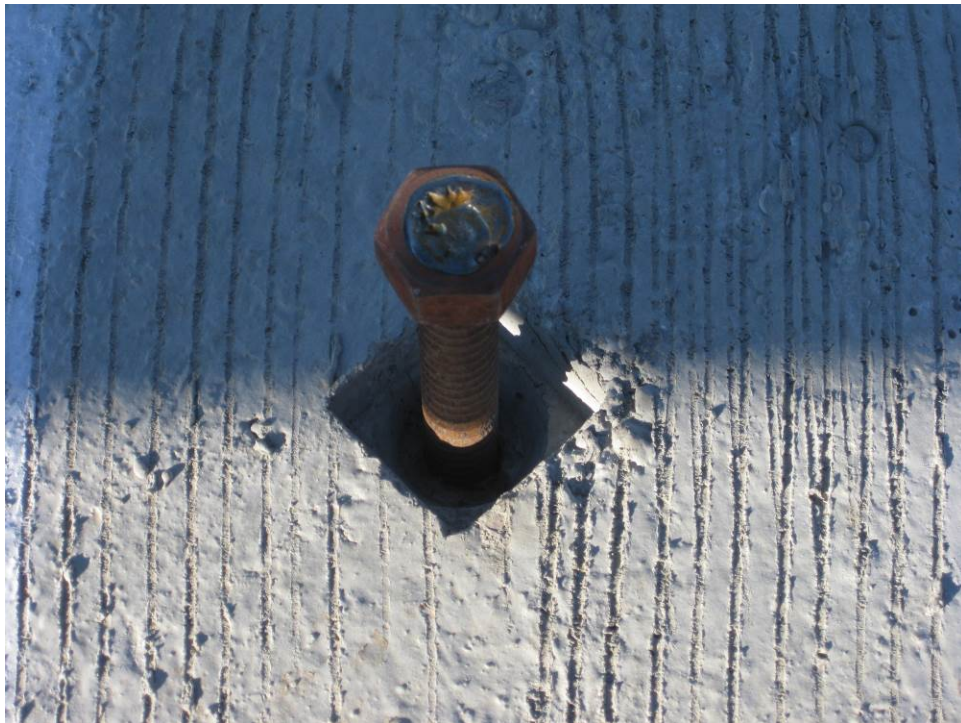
Leveling bolt for leveling an individual bridge deck panel.
